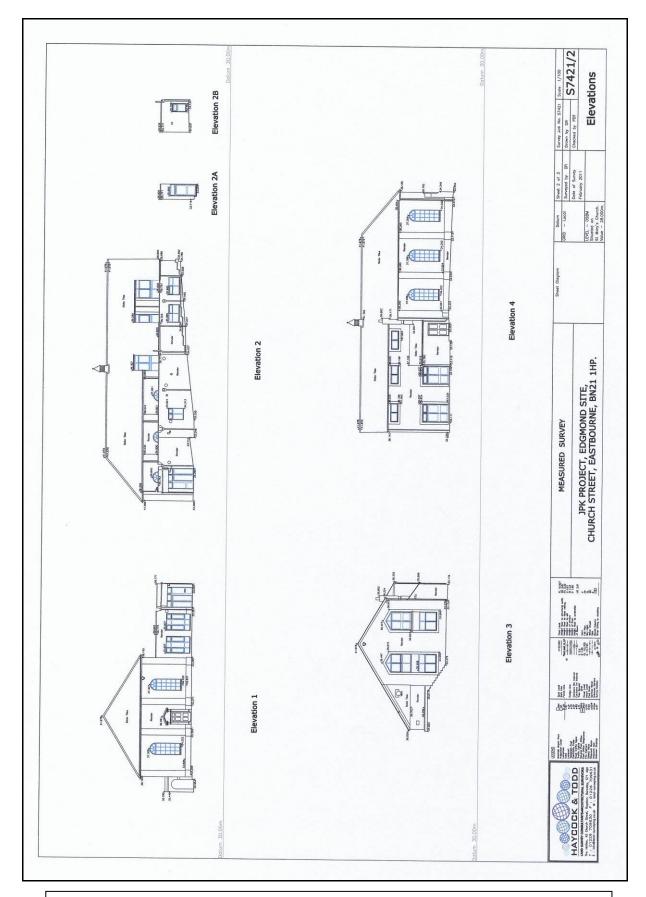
Edgmond Chapel, Eastbourne: Elevations of Current Building (adapted from architects drawing)
